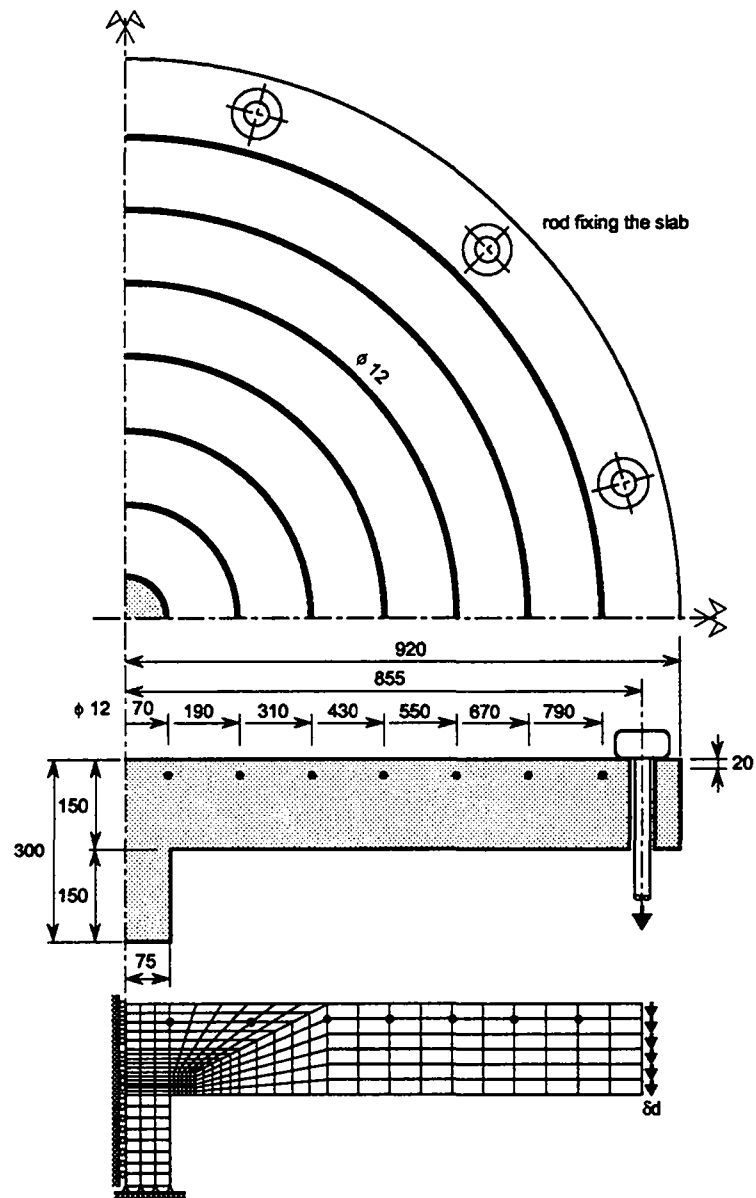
Overview, cross-section and mesh of slab with ring reinforcement
